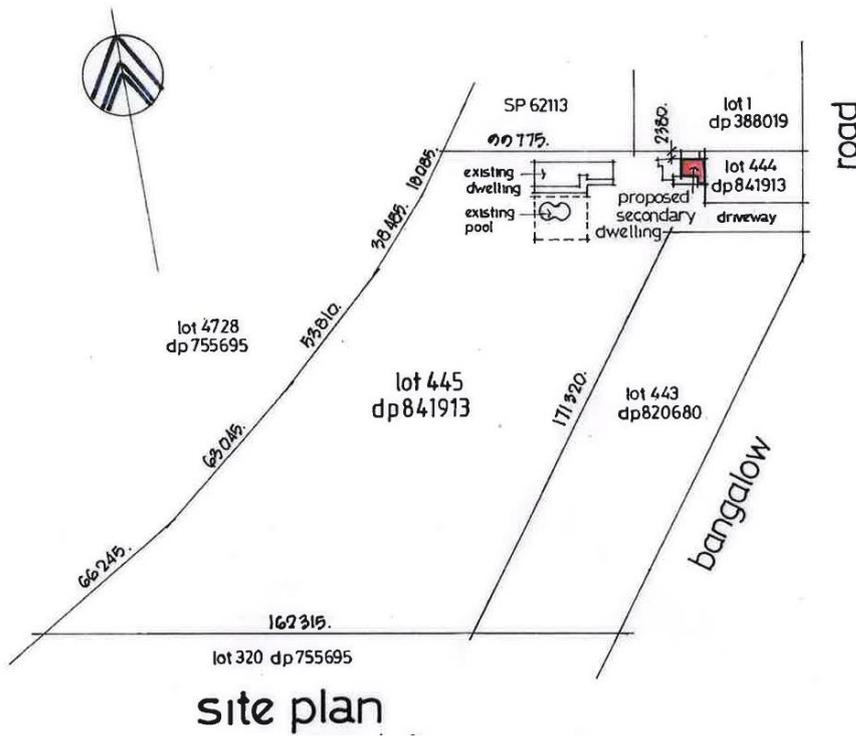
Site plan extract showing location of proposed secondary dwelling.
